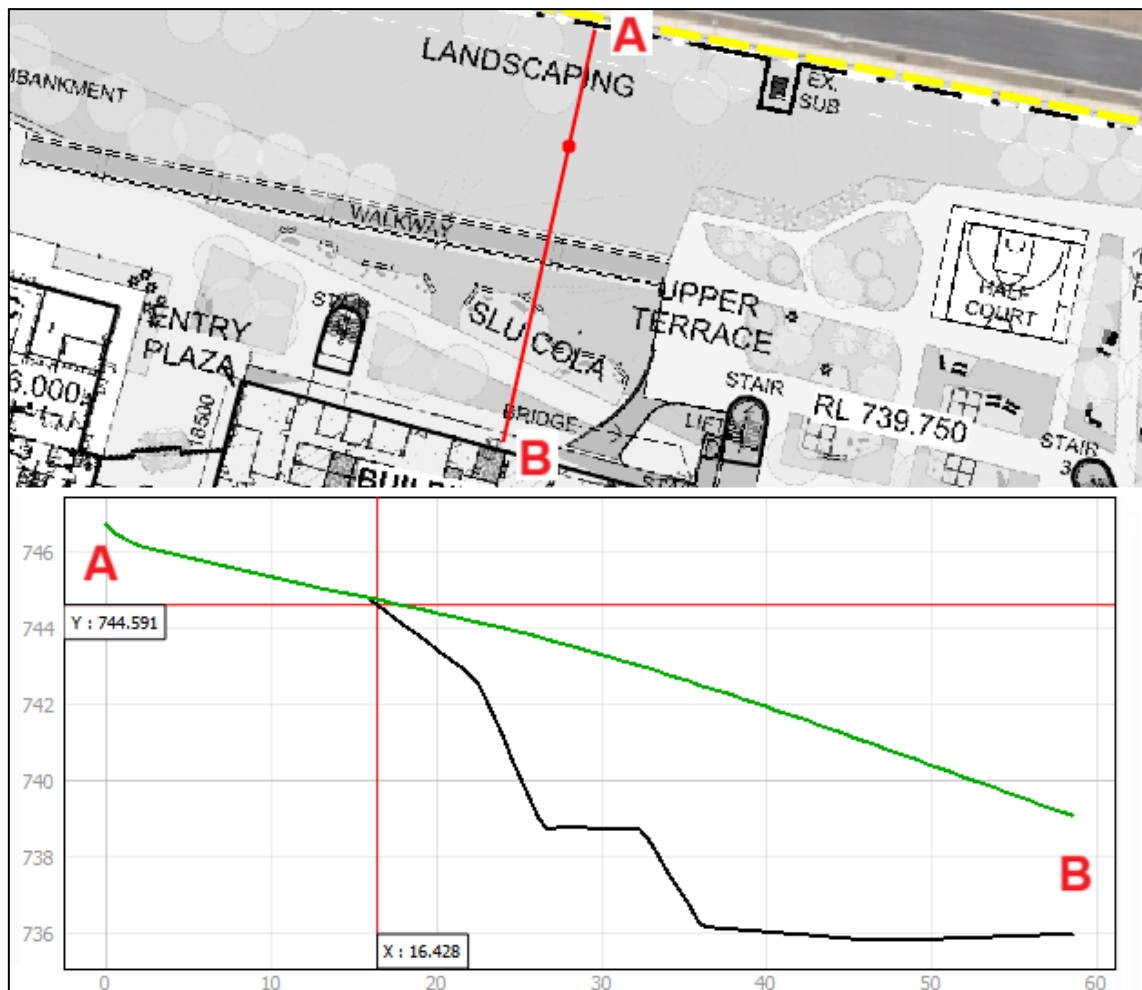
Cross-sectional profile from Bridget Ave (Point A) towards the proposed Building A (Point B)
